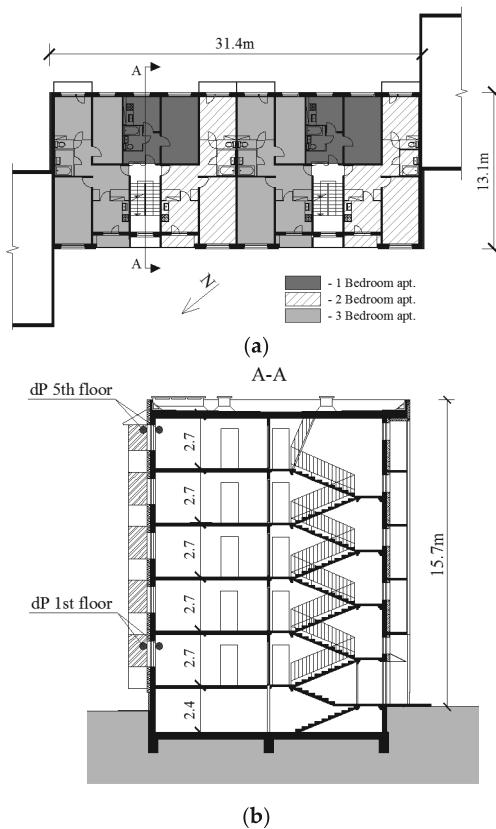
(a) Floor plan and (b) cross-section with pressure difference measurement point locations of the studied building.
